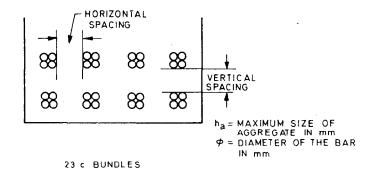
Minimum Bar Spacing Between Groups of Bars
